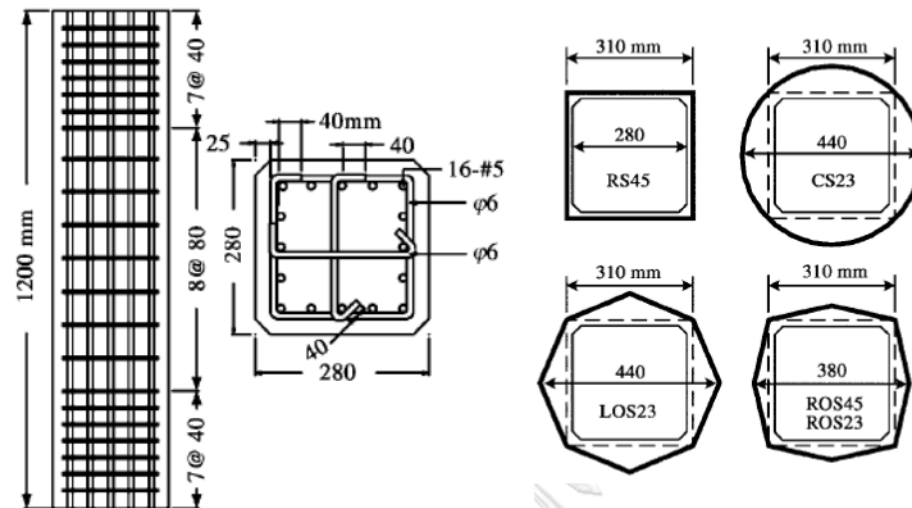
Detail of test specimen and steel jacketing schemes (Tsai and Lin, 2002)
